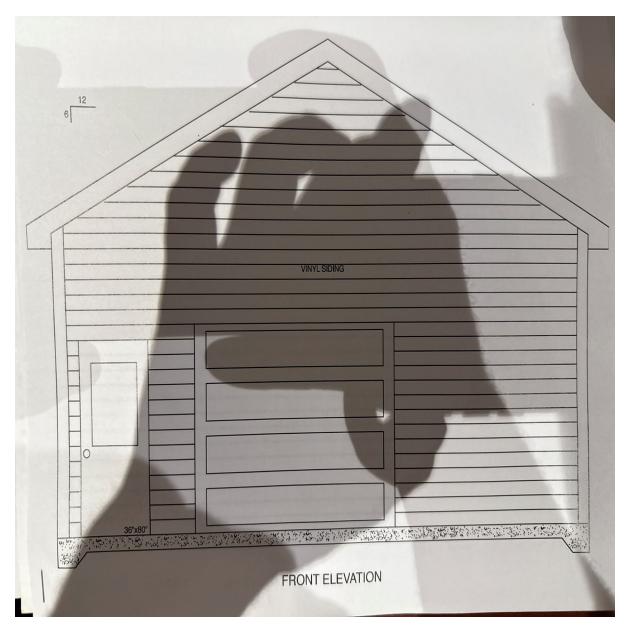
Front elevation of the proposed garage, (c/o Owner).
